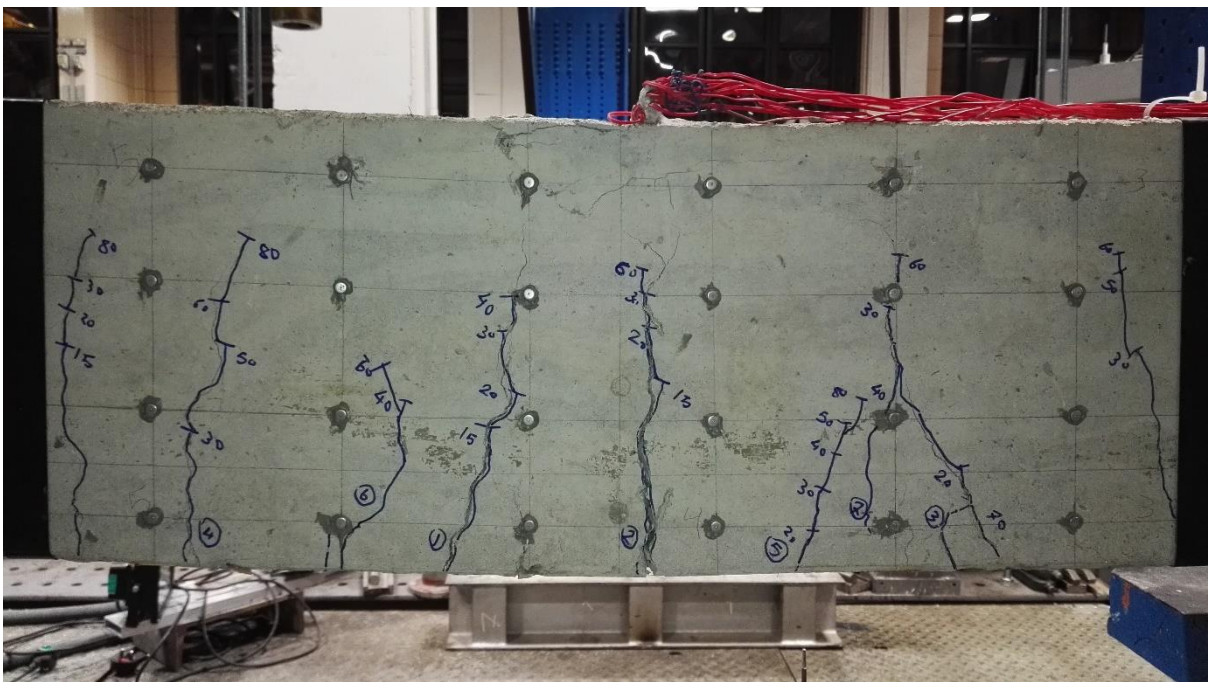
Final cracking pattern in constant moment zone in beam B2016.
